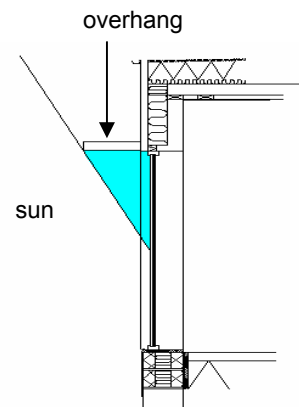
overhang of 200 mm over windows facing south. Not to scale
